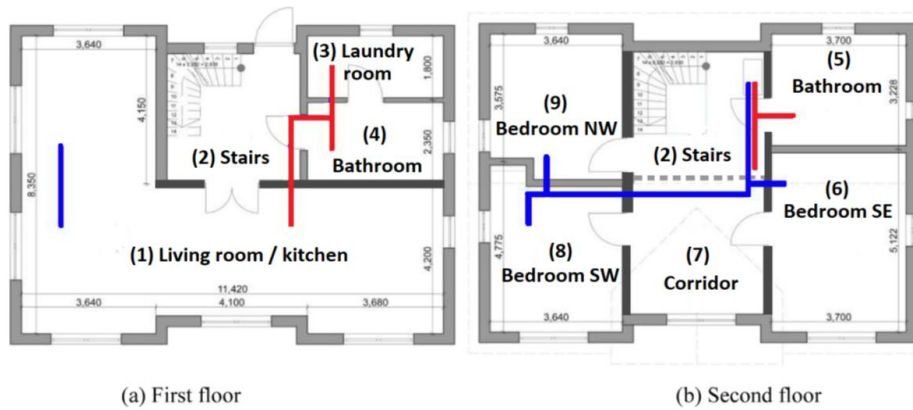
Floor plan of the test building (ducts for the supply air are in blue and in red for extraction).
